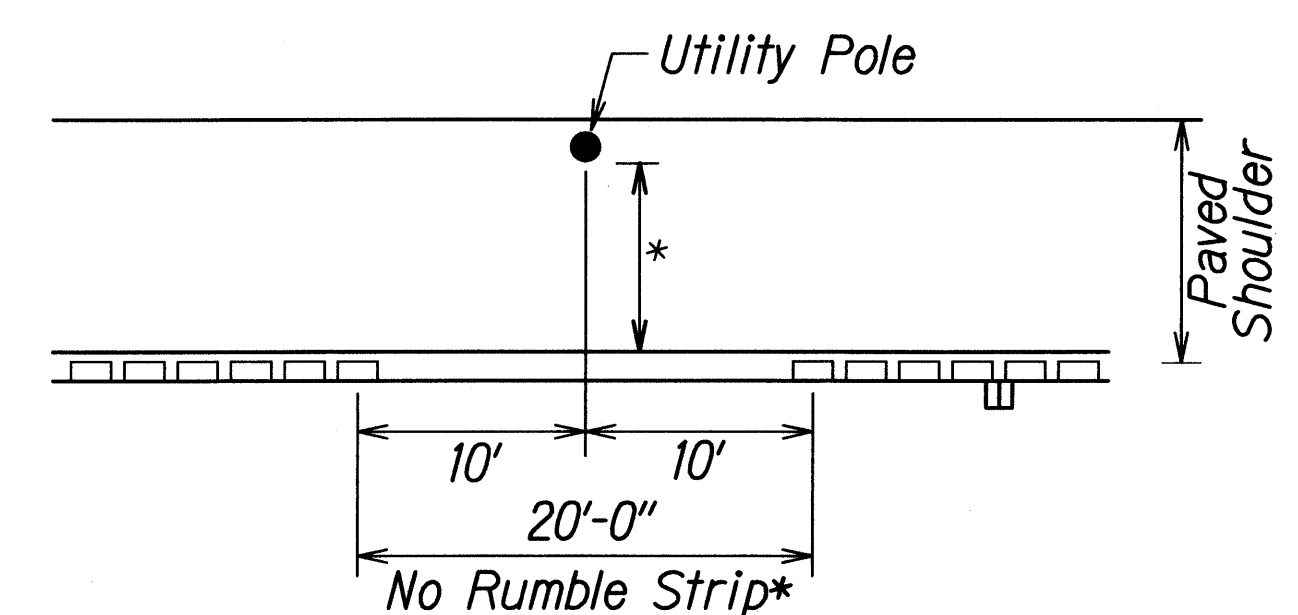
DETAIL - EDGELINE MILLED RUMBLE STRIP
